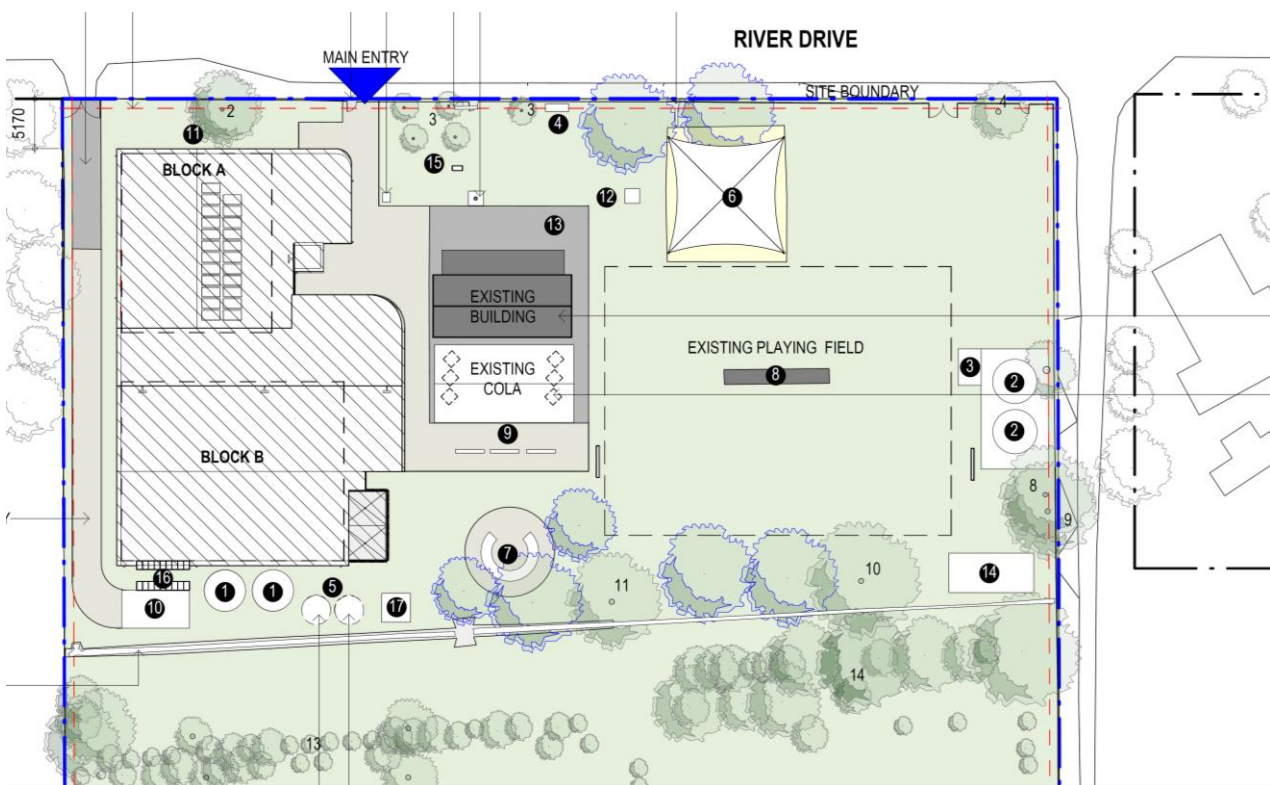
Proposed Site Plan (Source: Pedavoli Architects)
